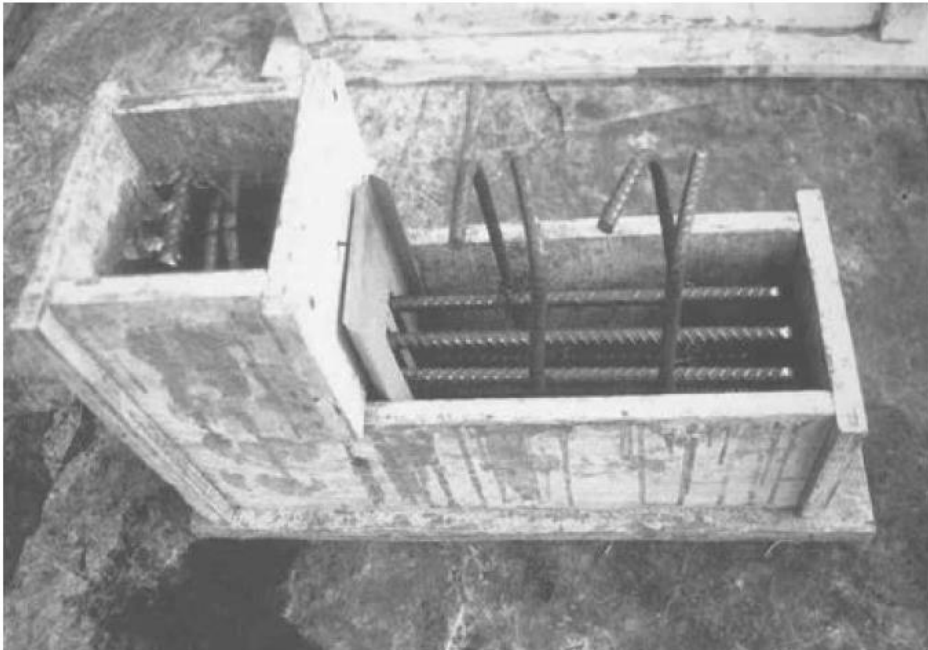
Cold joint specimen before concrete casting, Kahn & Mitchell (2002)
